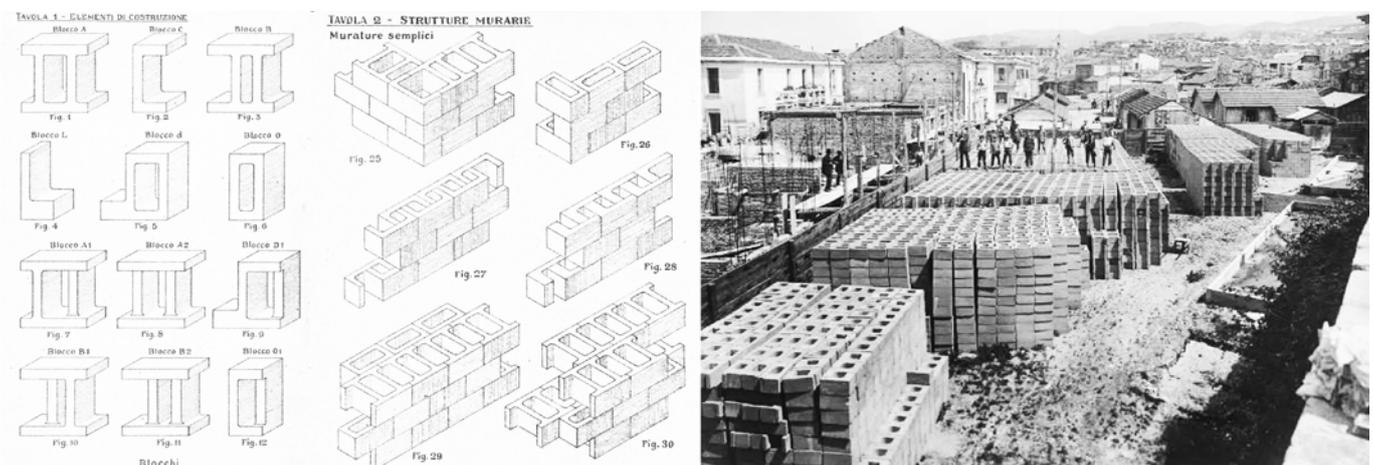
(left) overview of prefabricated building blocks designed by Gino Zani in the 1920s and different configurations of simple masonry structures and (right) Construction site for realization of blocks © Fondazione Gino Zani [www.ginozani.org](http://www.ginozani.org).
